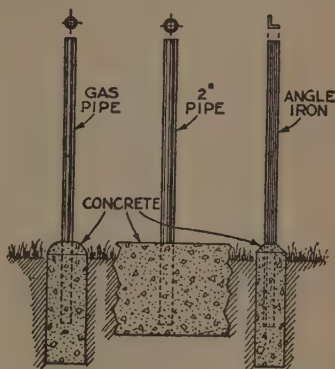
How pipes or angle irons are set in concrete to serve as posts.
